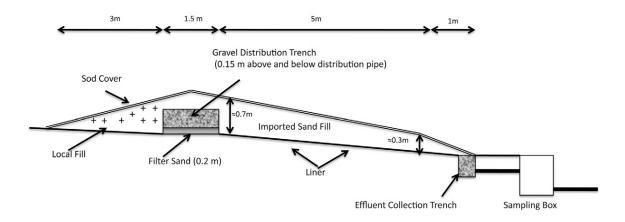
Cross-sectional schematic of the C2 raised contour trenches installed at the Bio-Environmental Engineering Center in Truro, NS (Bridson-Pateson et al., 2013).
